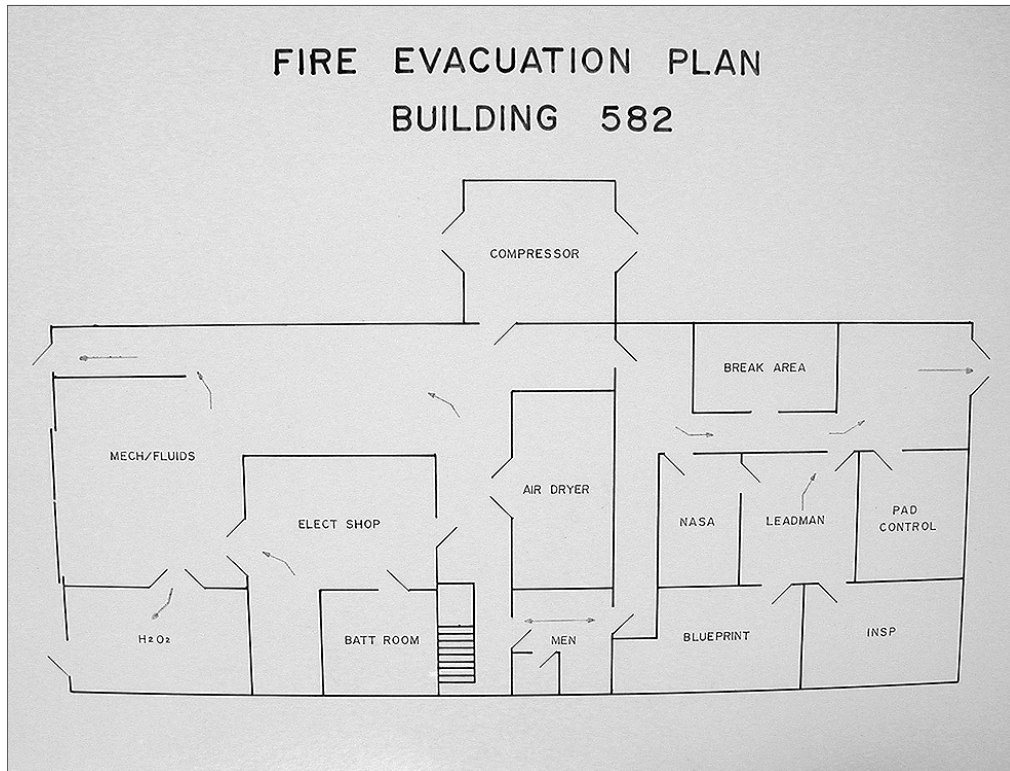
Fire evacuation plan showing two-bay storage addition subdivided into offices and break area, 2008 (ERDC-CERL).
